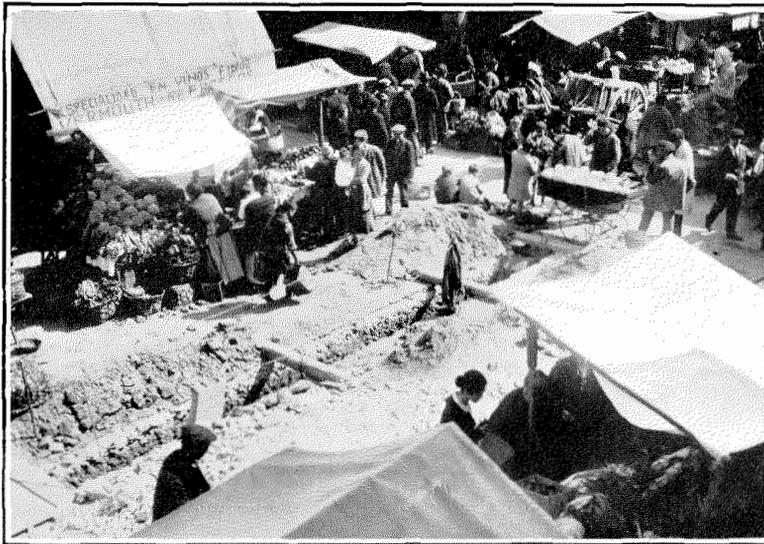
Running the Telephone Cable Trench through a Crowded Market-place in Augusto Figueroa Street, Madrid.
